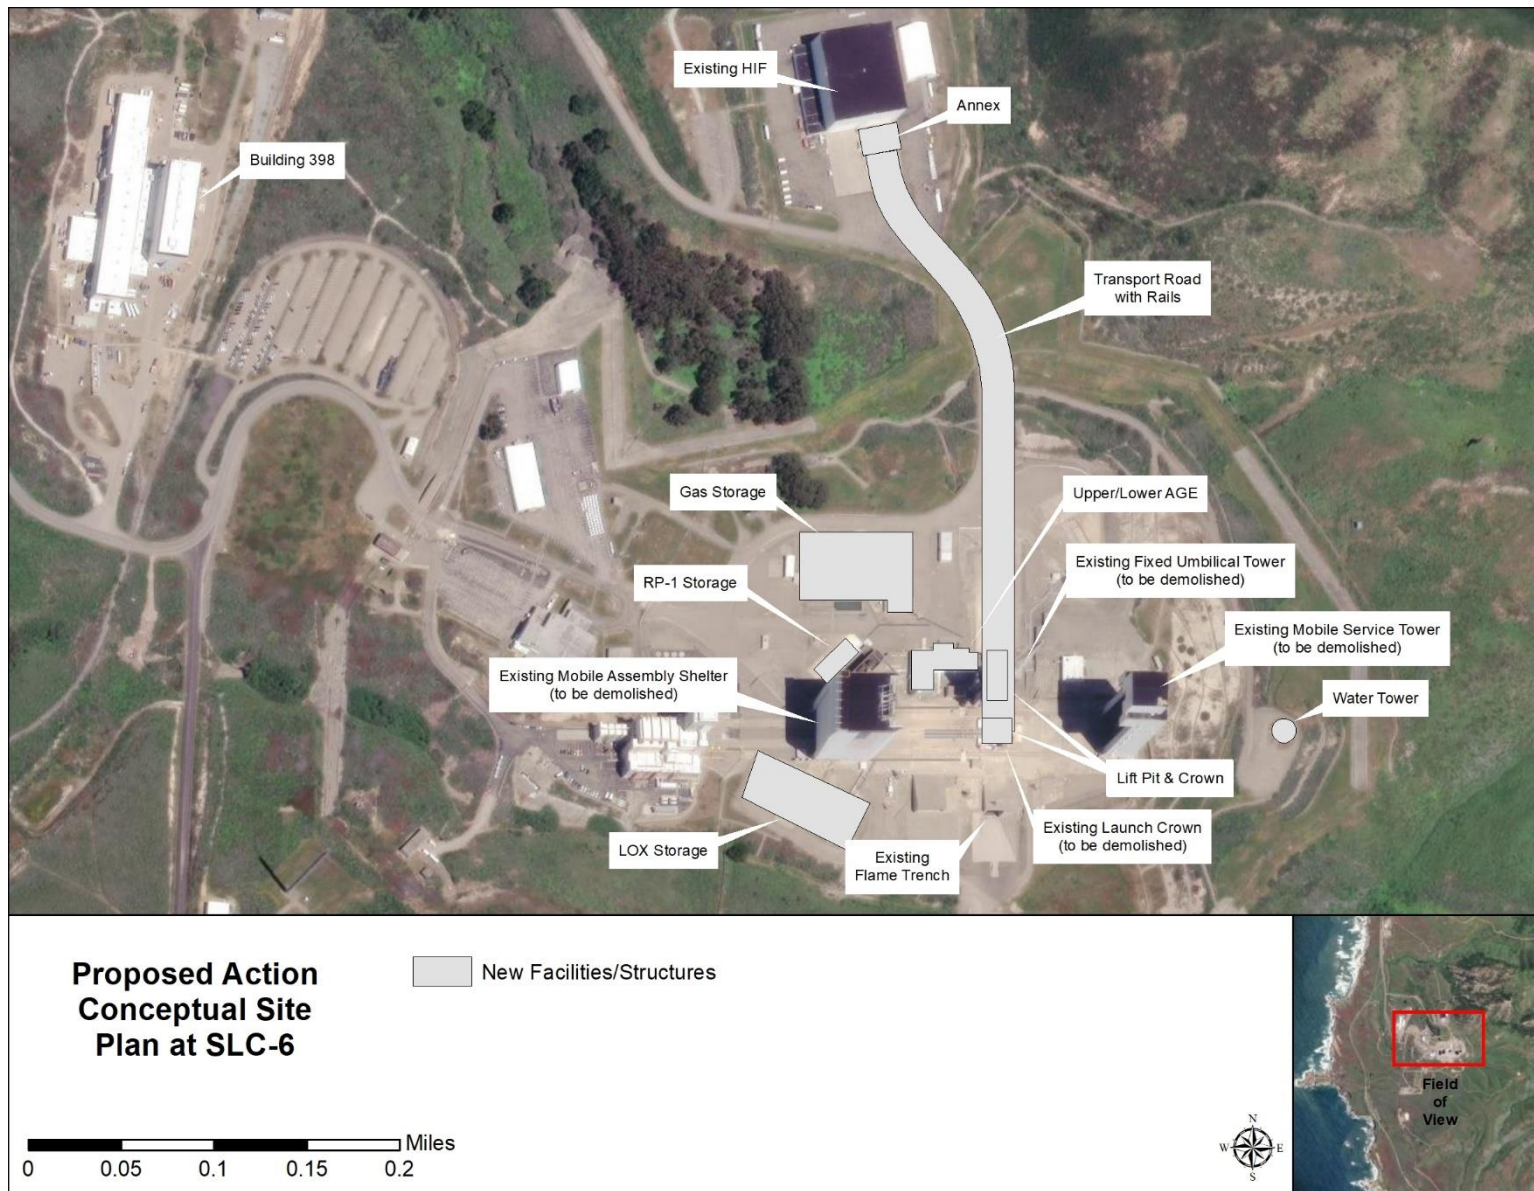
Proposed Action – SLC-6 Conceptual Site Plan
